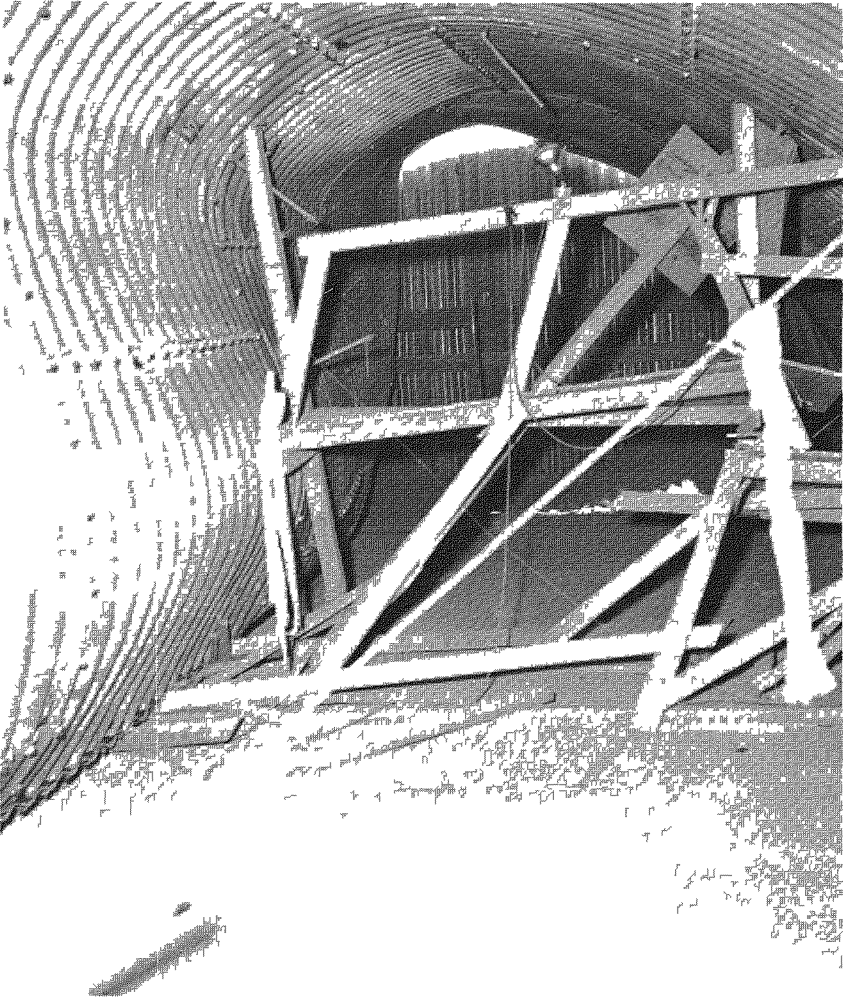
46 Severe damage to earth-covered surface corrugated steel structure
